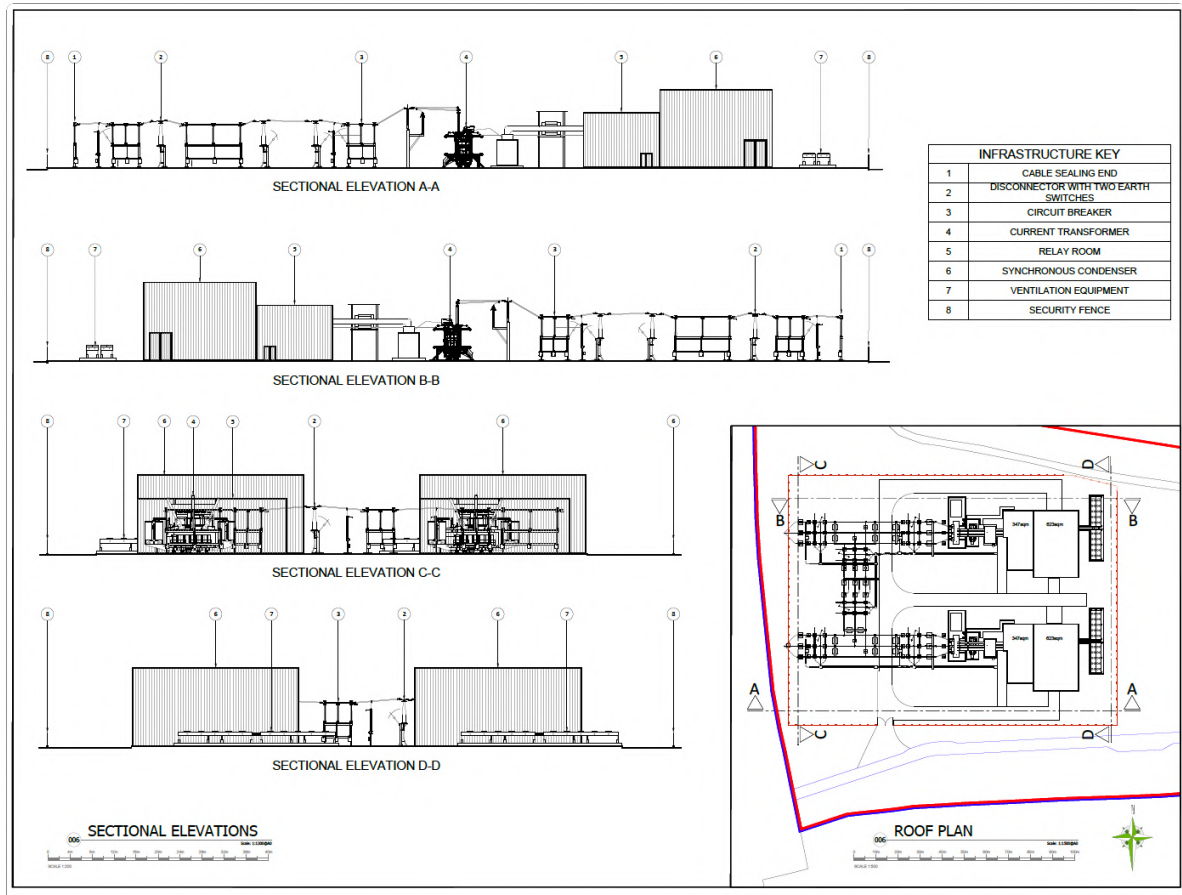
PROPOSED DEVELOPMENT ELEVATIONS
